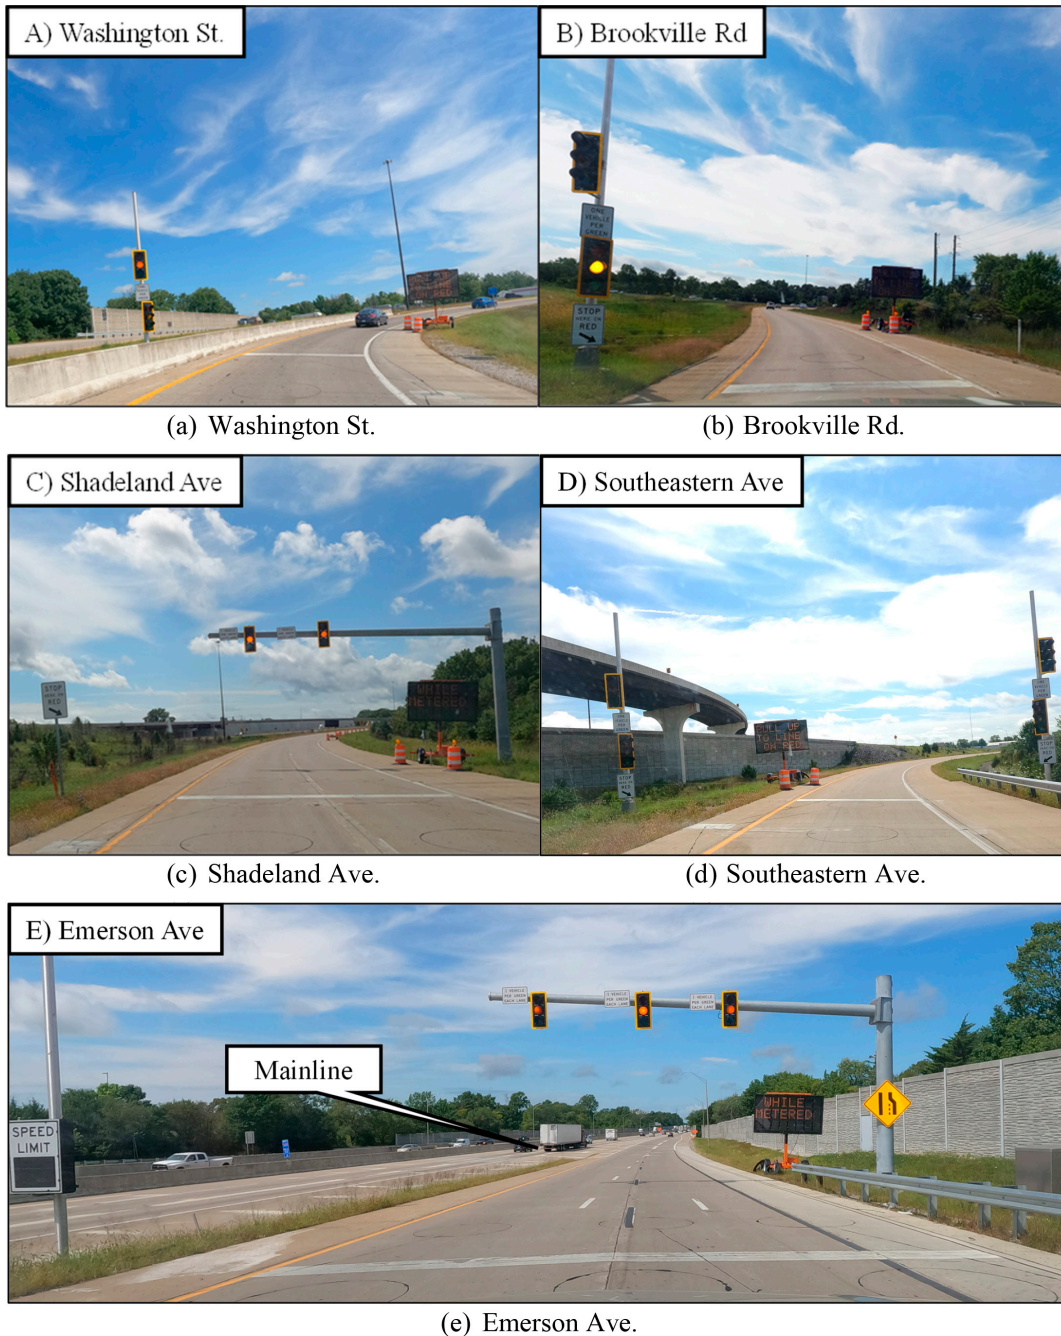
Drive-Through Footage of Ramp Meters on I-465.
